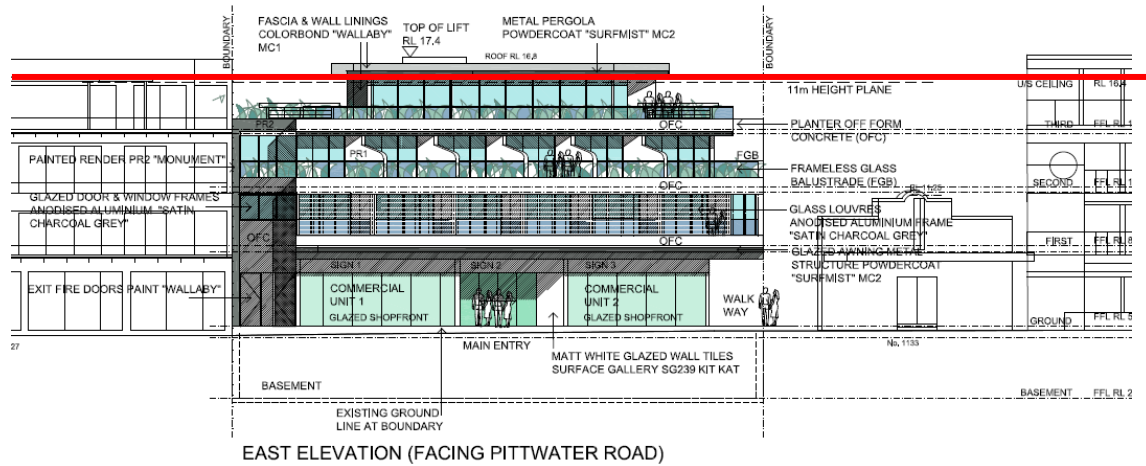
Plan (east elevation) extract showing extent of 11 metre building height breach
